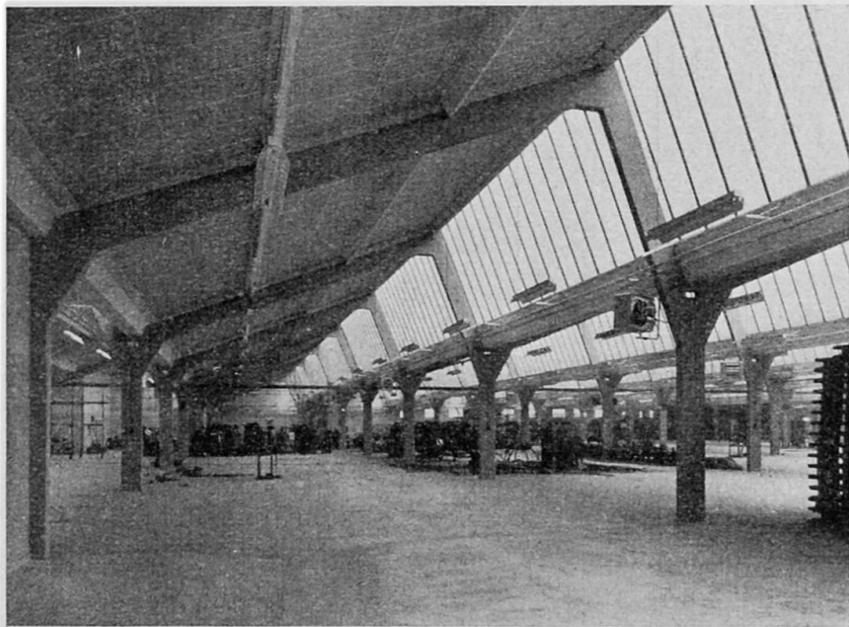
Precast northlight framework for factory at Bracknell New Town.
